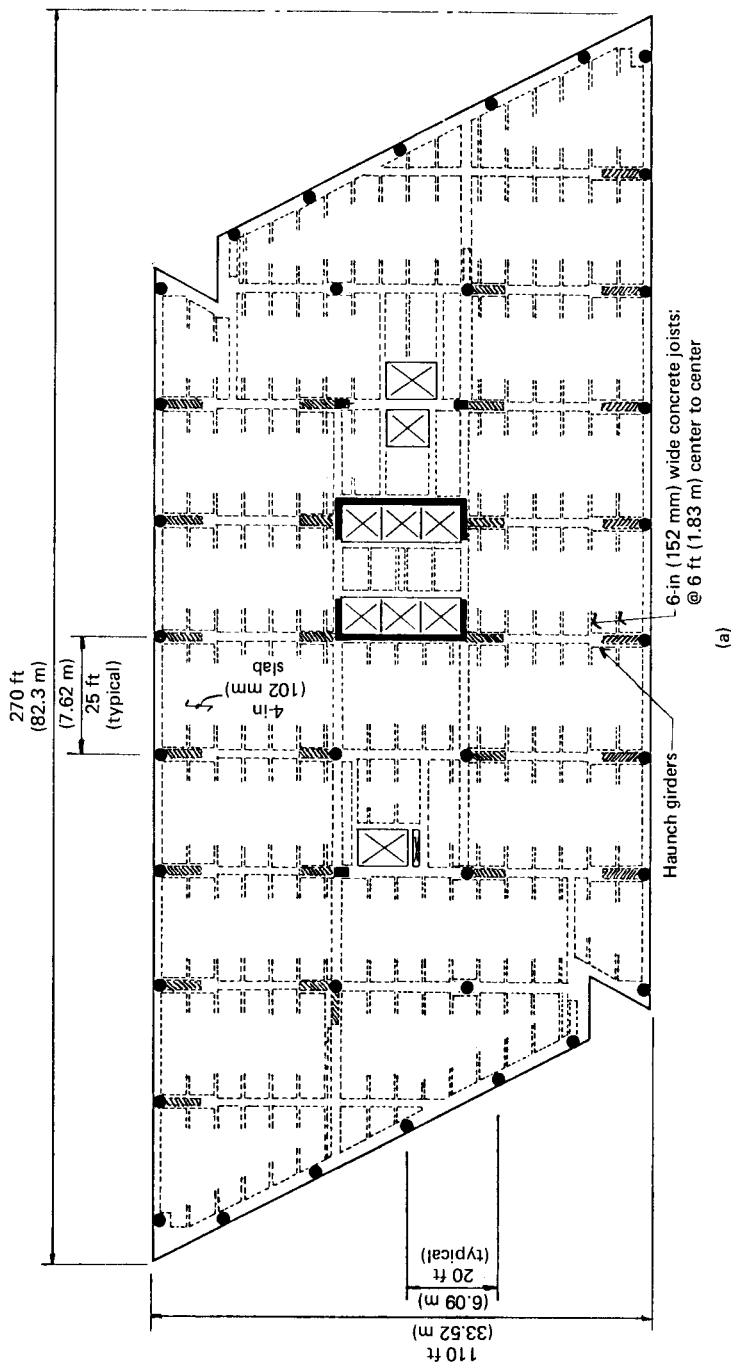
(a) Typical floor plan of interacting shear wall-frame system.
